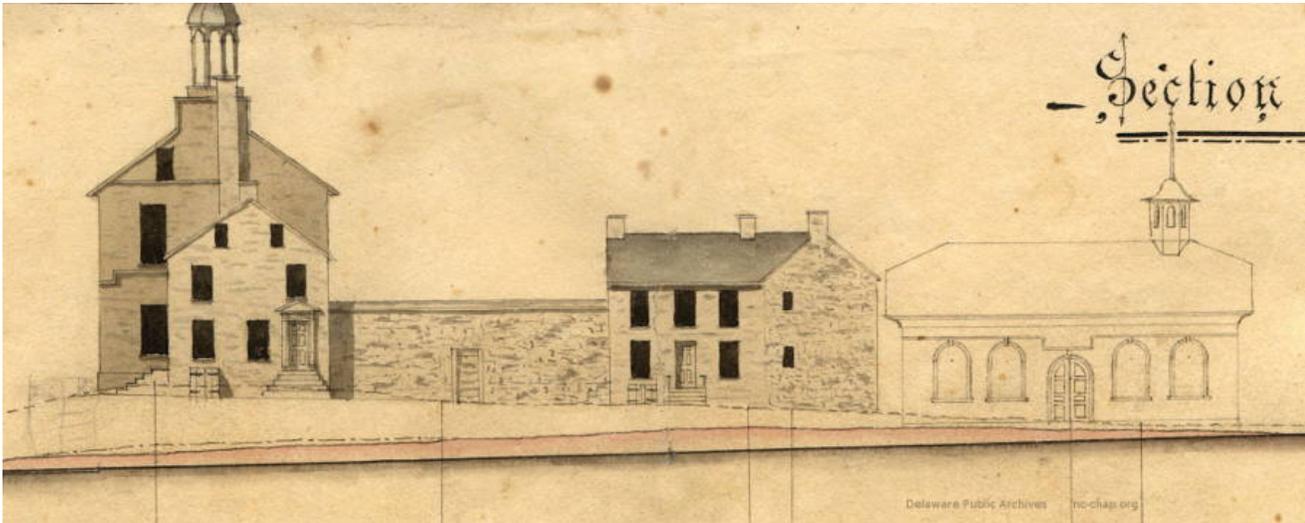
Detail from Market Street of the east elevation of the Court House, Sheriff's House and Jail, and Immanuel Church. From Latrobe's 1805 "Plan of the Town of New Castle." (Delaware Public Archives)
